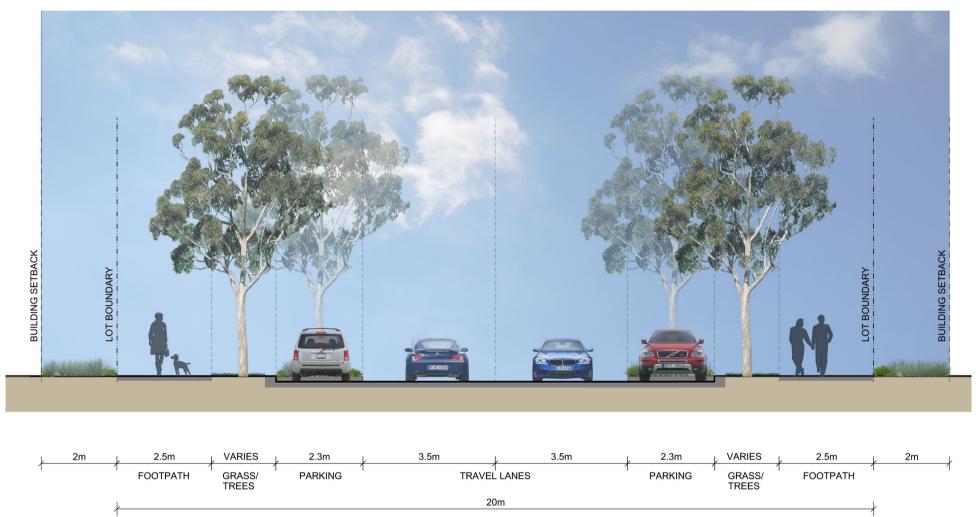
Local Street Special Park Edge_Scale 1:100 @ A3
